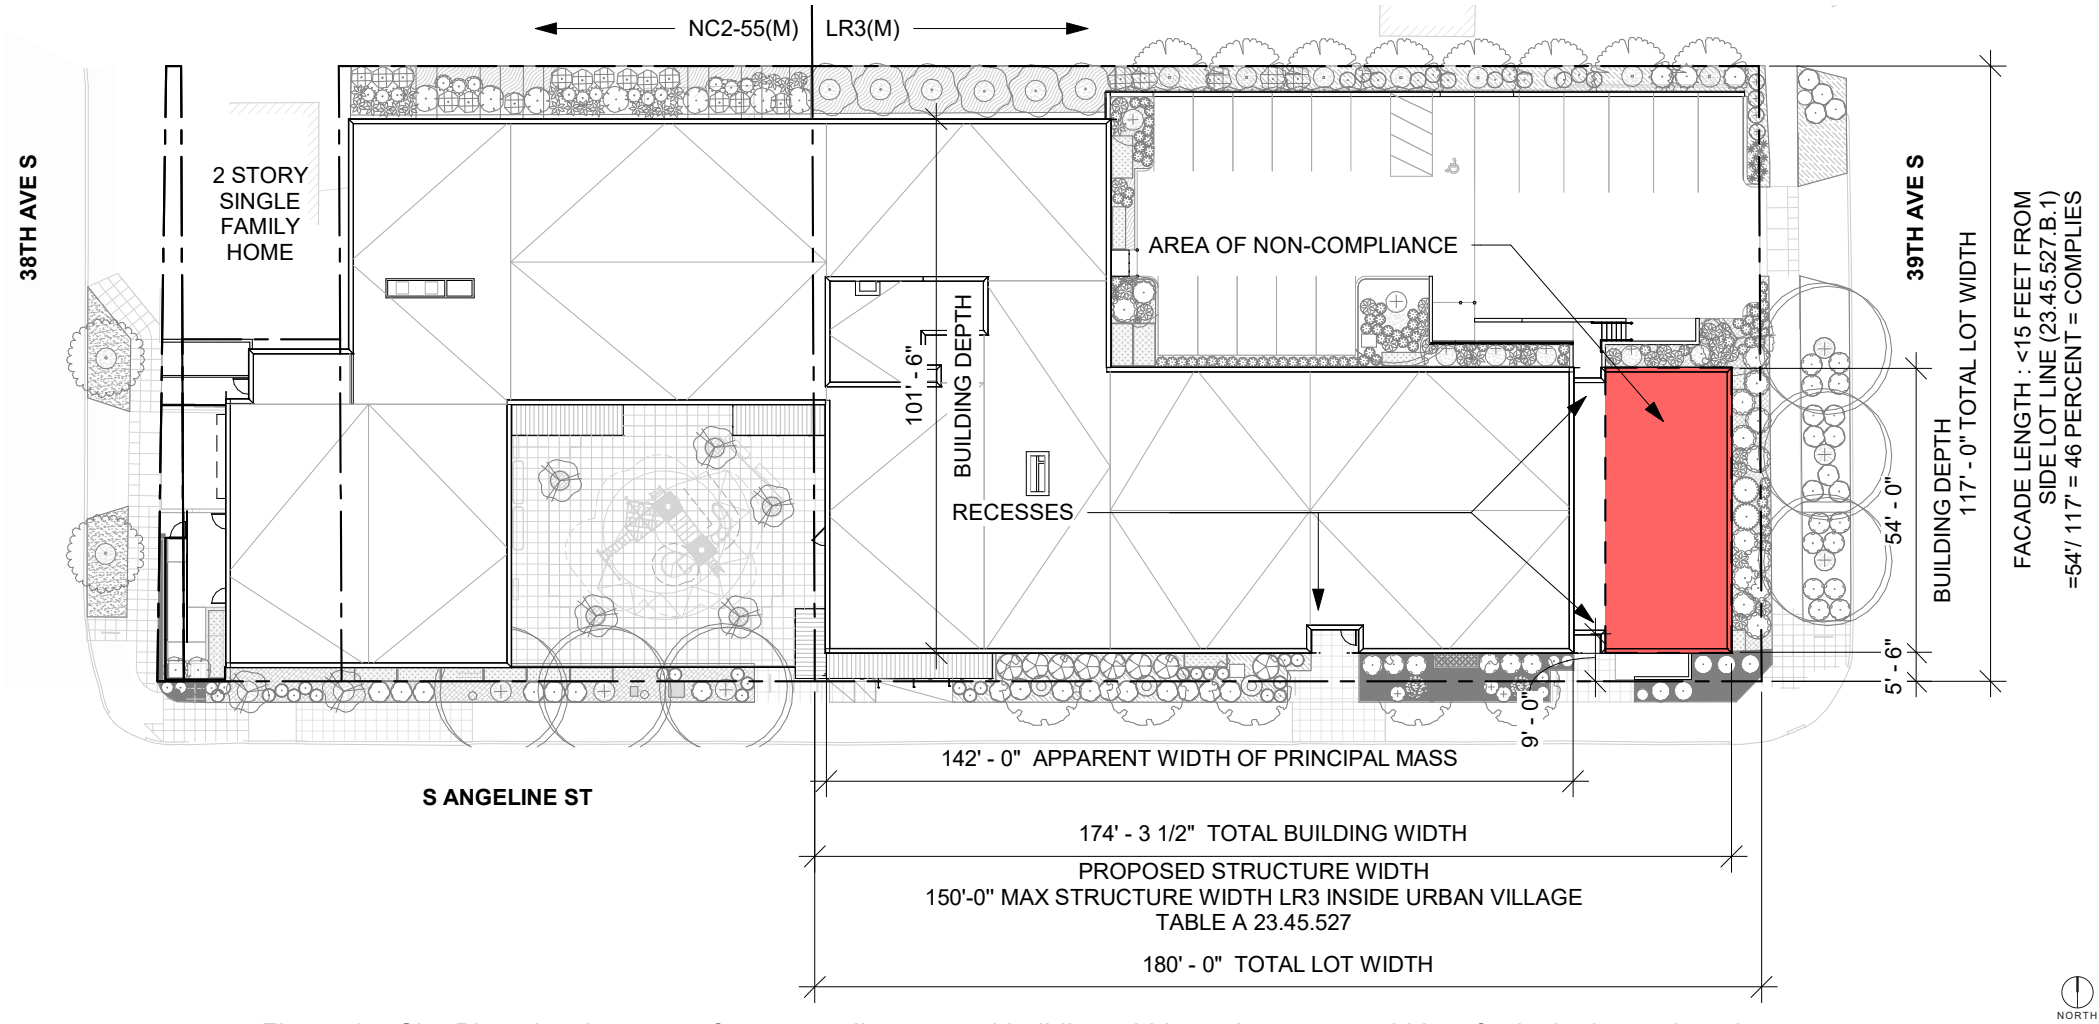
Site Plan showing area of non-compliance, total building width, and apparent widths of principal massing elements.
